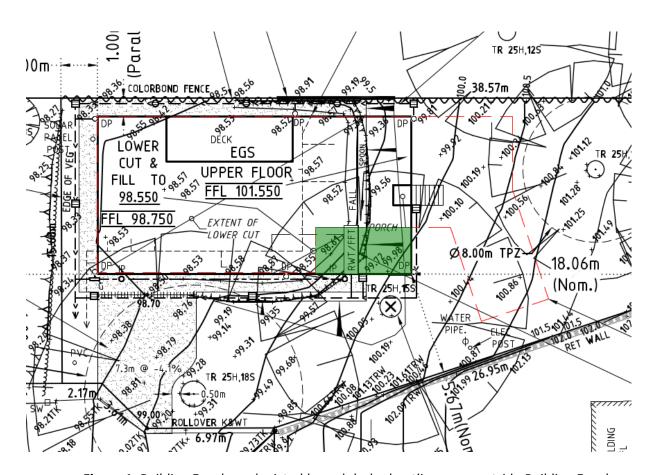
Building Envelope depicted by red dashed outline, area outside Building Envelope shaded in green
